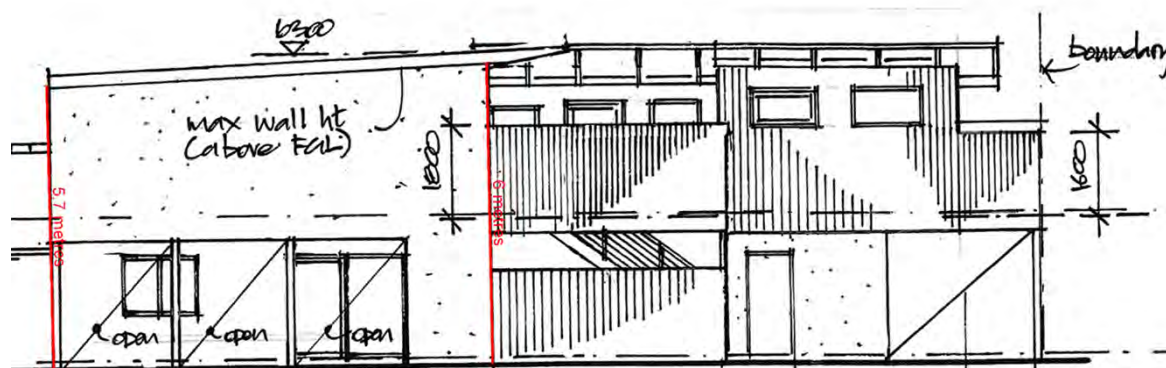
Illustration of the east facing boundary wall and upper floor balcony.
